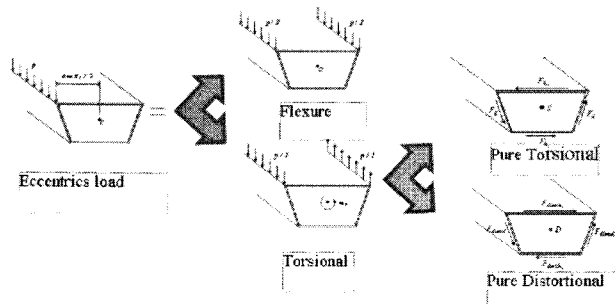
Load disposition of single cell trapezoidal box girder bridges
